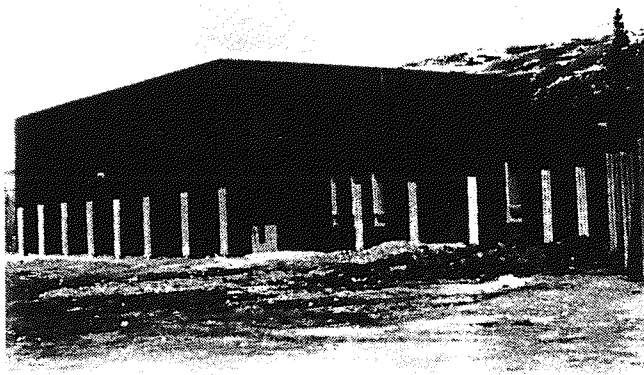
Early application of heat pipes as a heat exchanger beneath a slab-on-grade foundation over permafrost at Ross River, Yukon.
